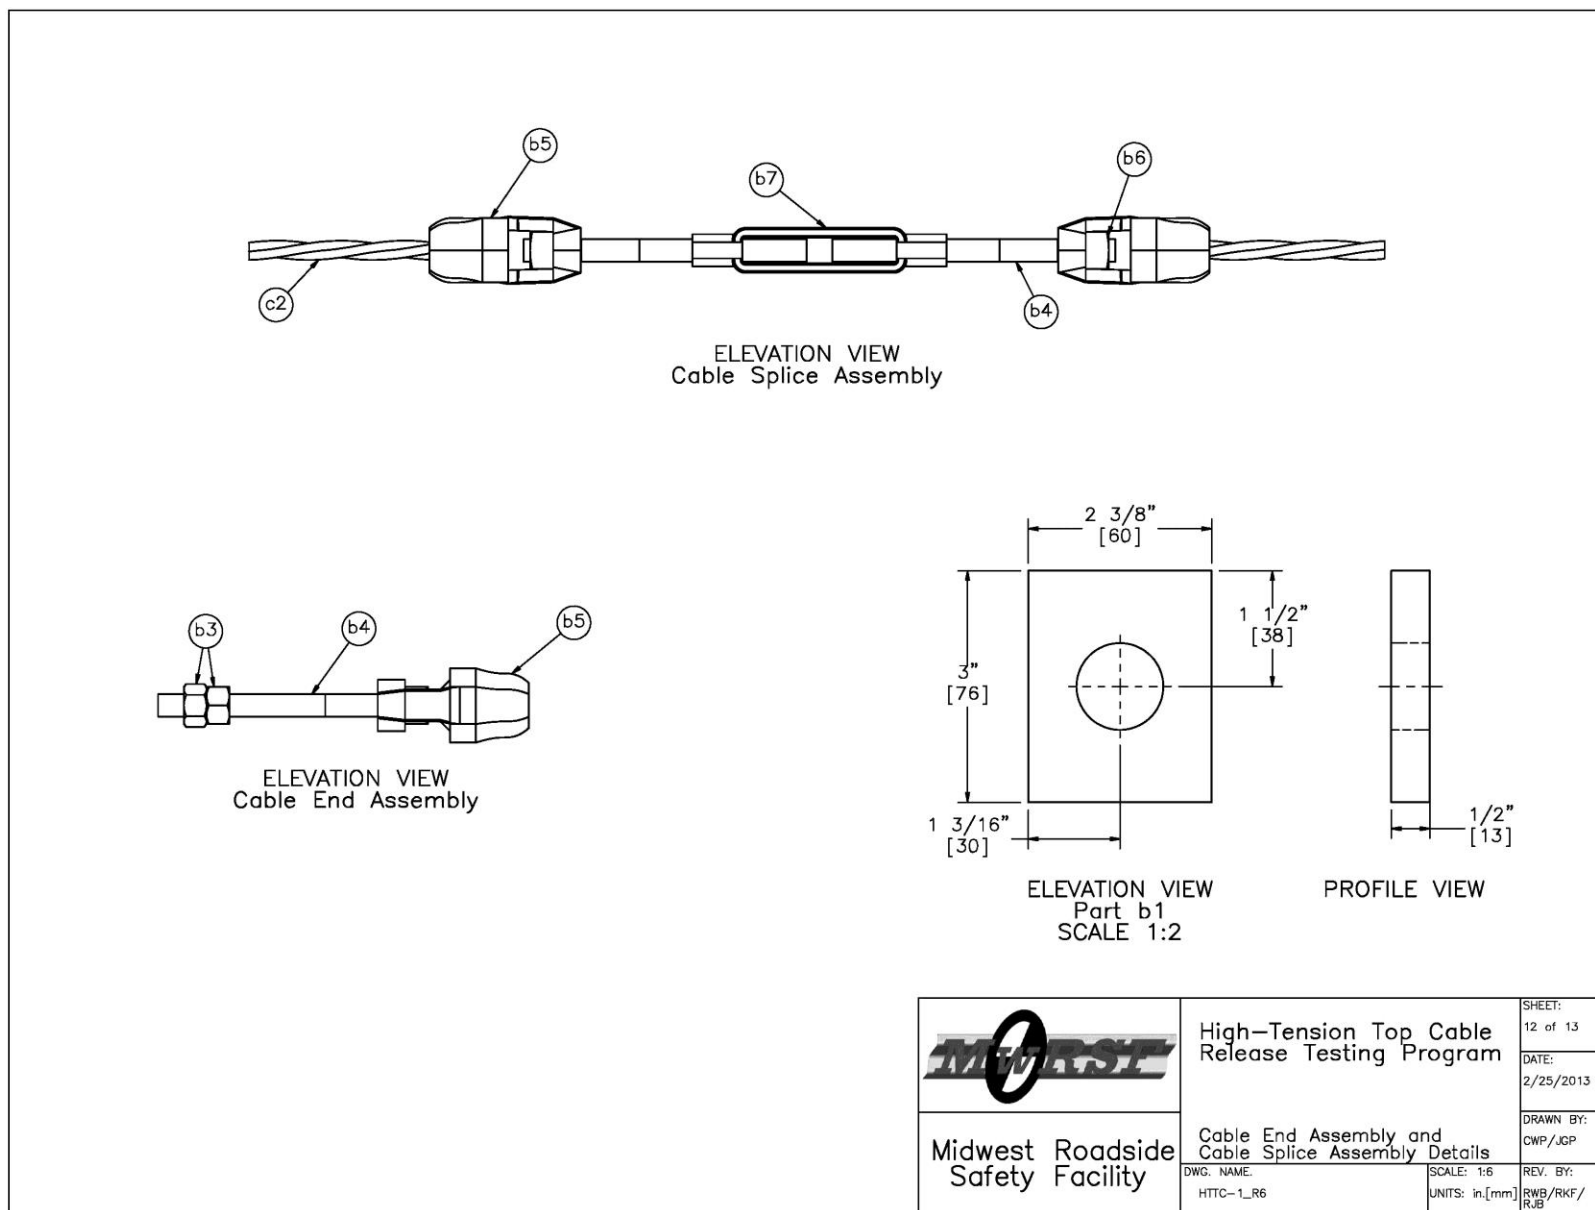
Cable End Assembly and Cable Splice Assembly Details, Test No. HTTC-1
